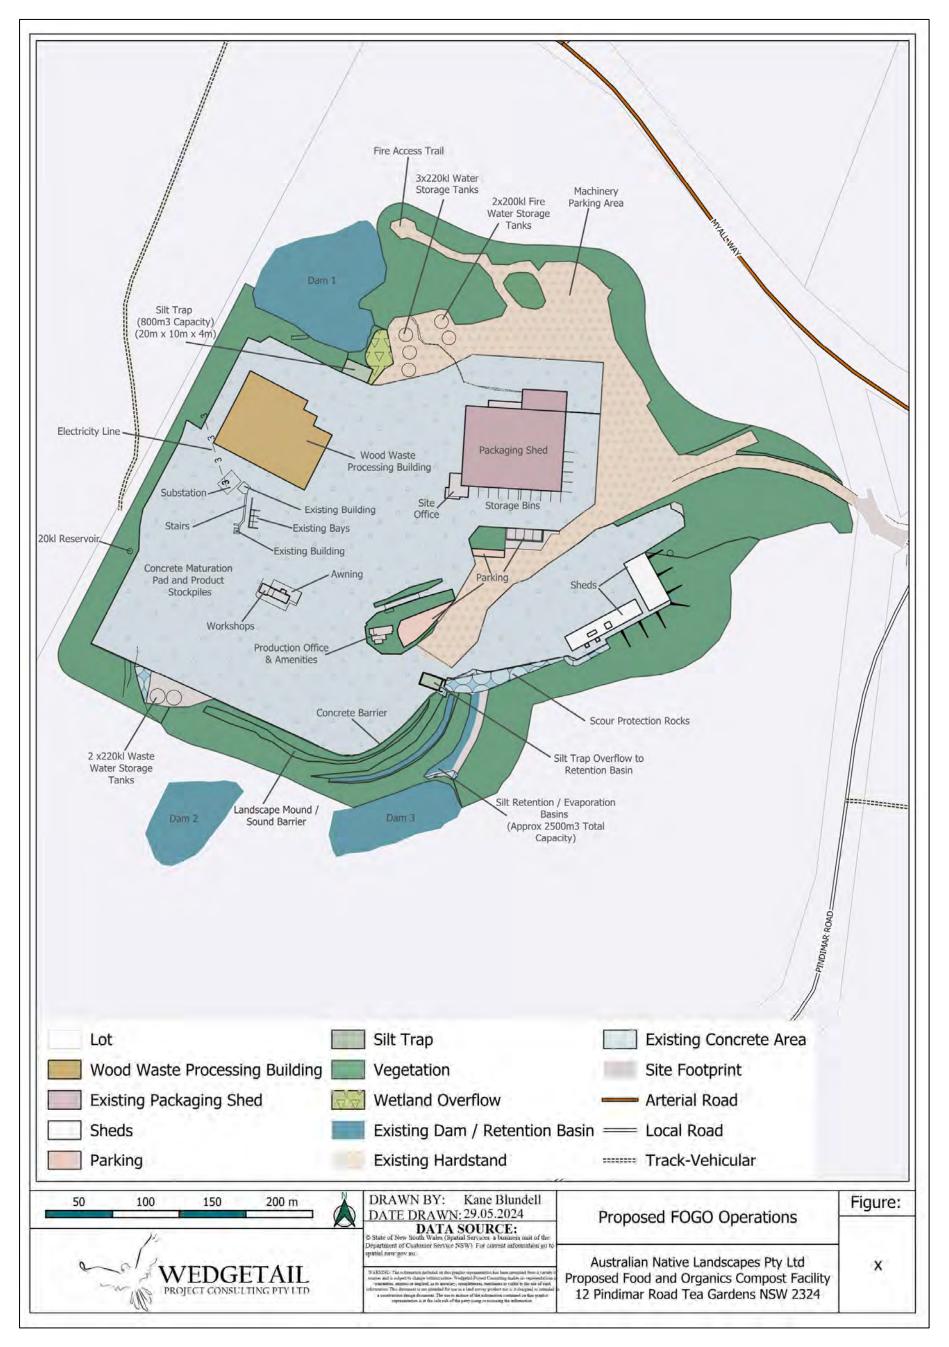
A layout plan of the proposed FOGO processing operation at the Tea Gardens Facility
